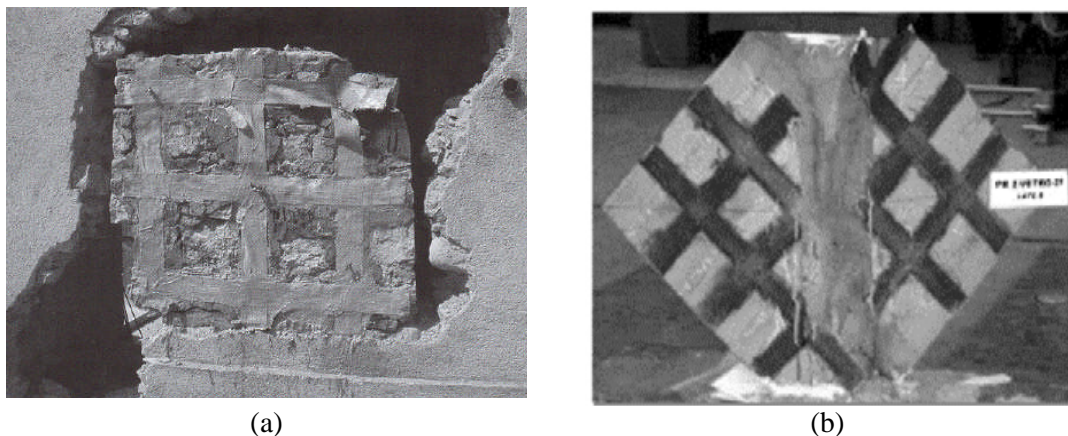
Experimental tests on specimens strengthened with FRP strips: (a) existing stone masonry [8], (b) new masonry [12].
